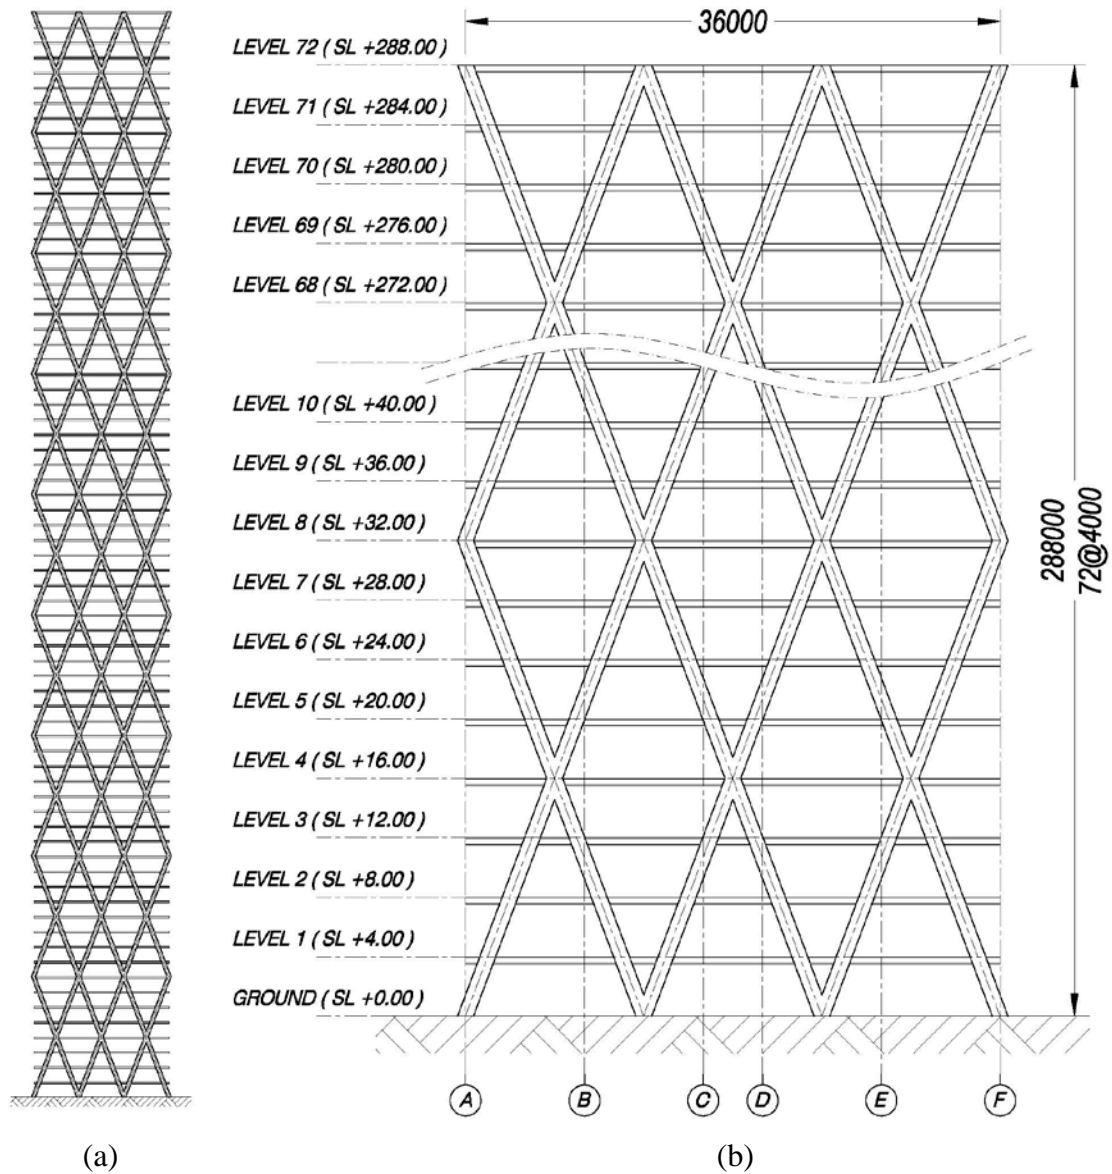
Prototype Building Drawing: (a) Full Height Elevation View, (b) Truncated Elevation View (all dimensions in mm).
